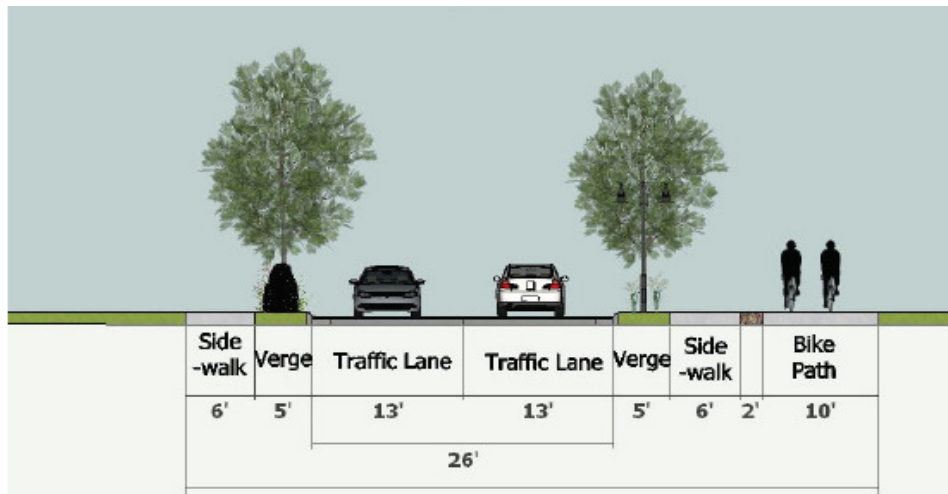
Parkway-type street configuration showing auto lane, boulevard planting, sidewalk, bike path
